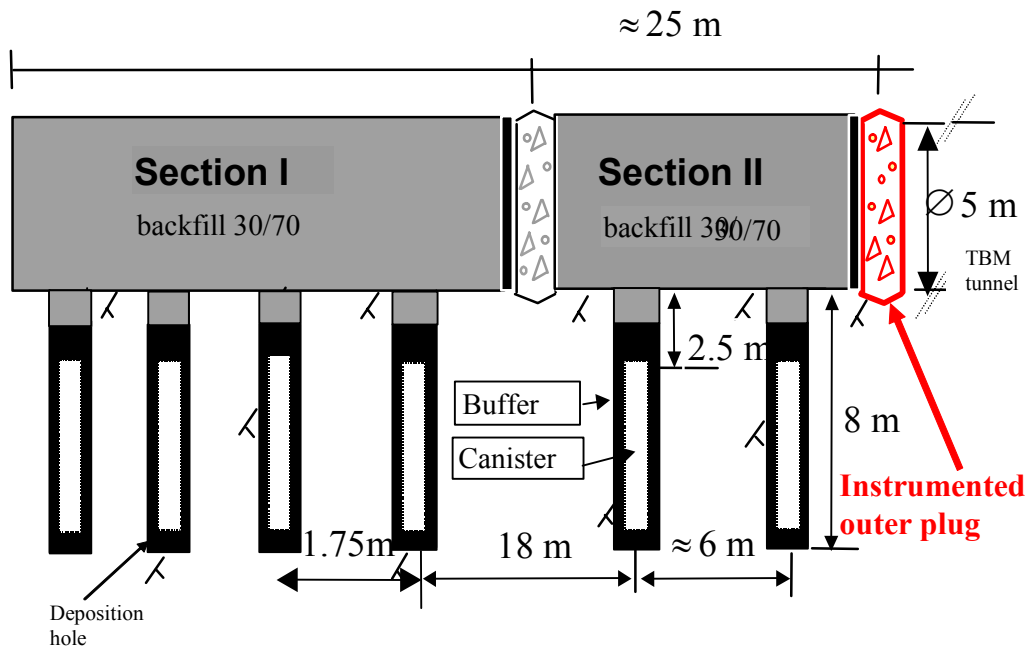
Schematic view of the layout of the Prototype Repository and deposition holes (not to scale)
